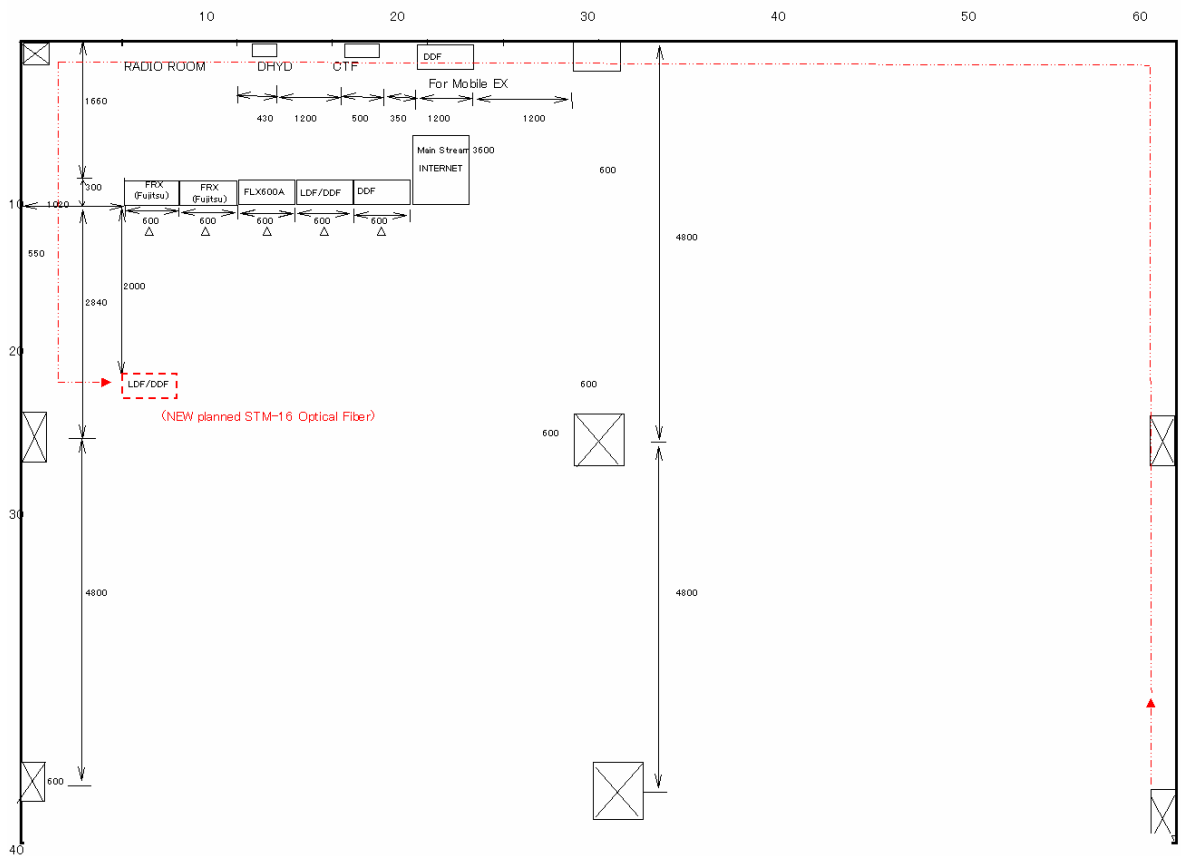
RADIO/MUX ROOM (2F) Planned Installation Place (NEFAS SILK)
